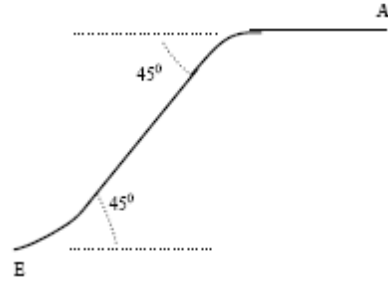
Side view of proposed steam piping layout (left hand side) from EL (+) 39.665 meter to 28.200 meter.
